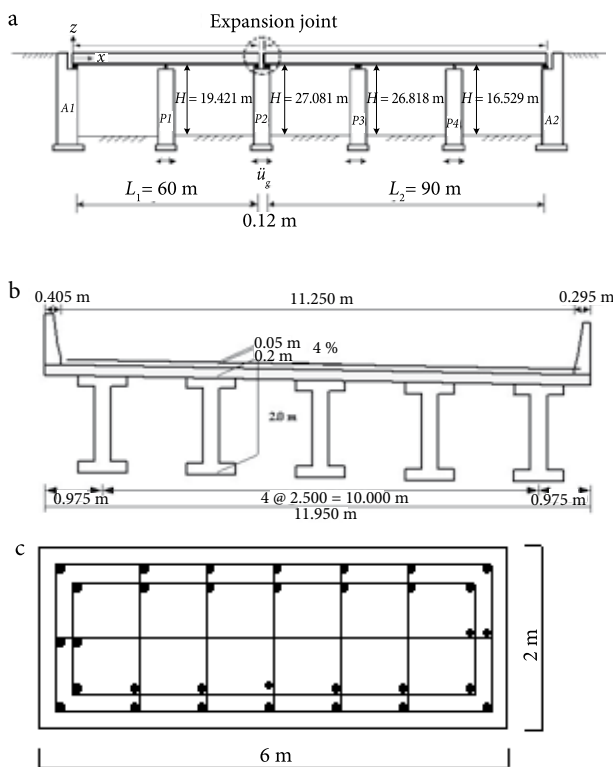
Longitudinal section (a), cross-sectional view (b) and steel reinforcements of piers (c) of sectional view of the selected bridge
